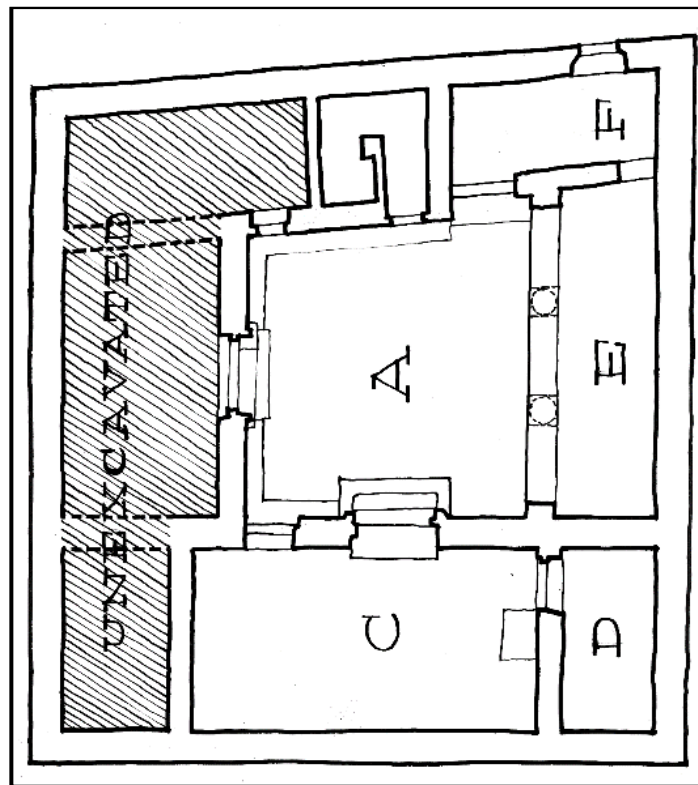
Publication ready plan based on figure 18. Artist unknown. Shaded areas were left unexcavated by Pillet – rooms were still filled with brick and debris when Hopkins re-started work on the building and rampart over the rear/western portion of the building. The long thin room, shaded in the upper left-hand corner (NW), is the baptistry. (YUAG)
